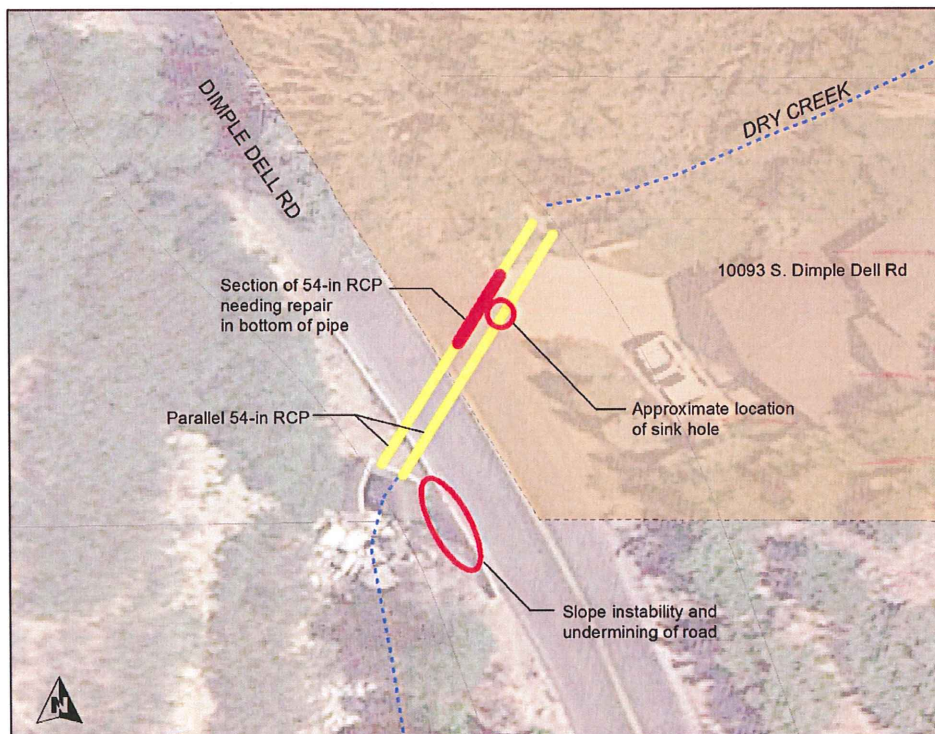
10093 S Dimple Dell Rd Pipe and Road Failure
